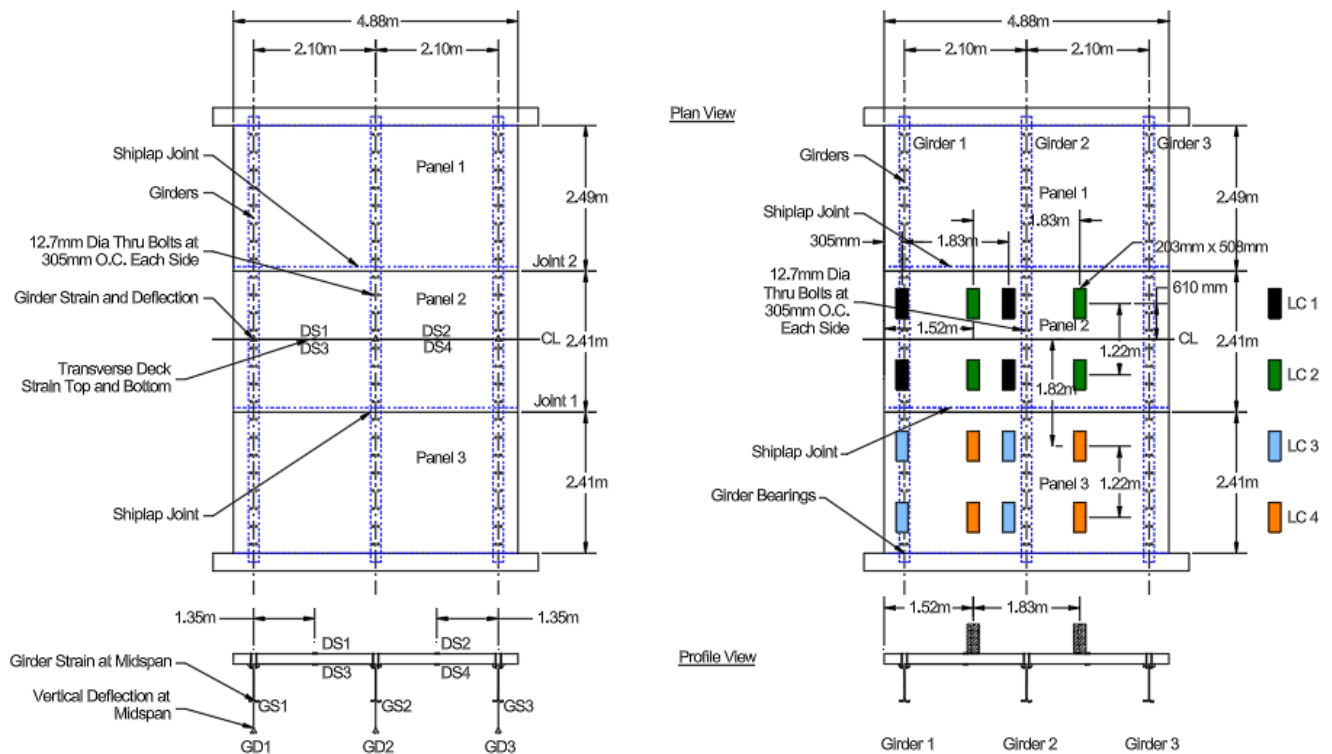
Three Girder Transverse Panel Configuration, Instrumentation, and Load Case Position
